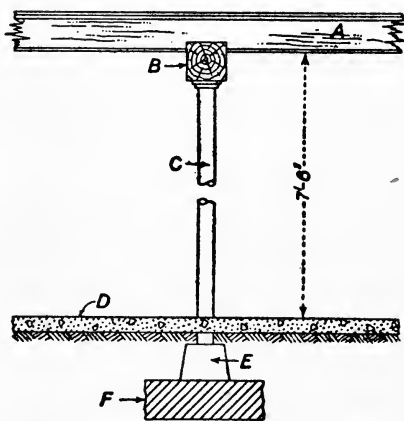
ELEVATION OF PIPE COLUMN—
